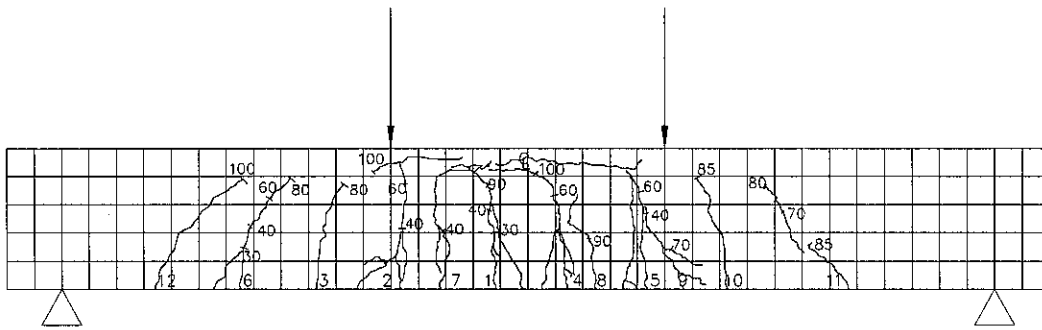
21. Crack pattern of NPPSCC beam specimen (bending failure)
